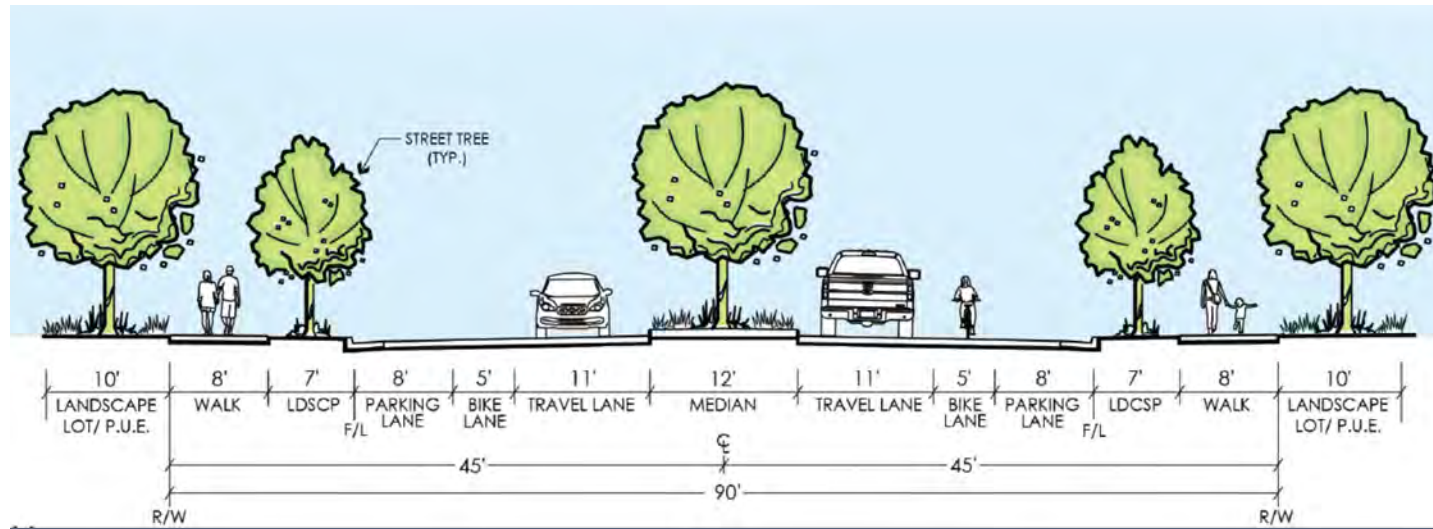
E. REDWOOD ROAD (EAST OF MOFFETT ROAD)
